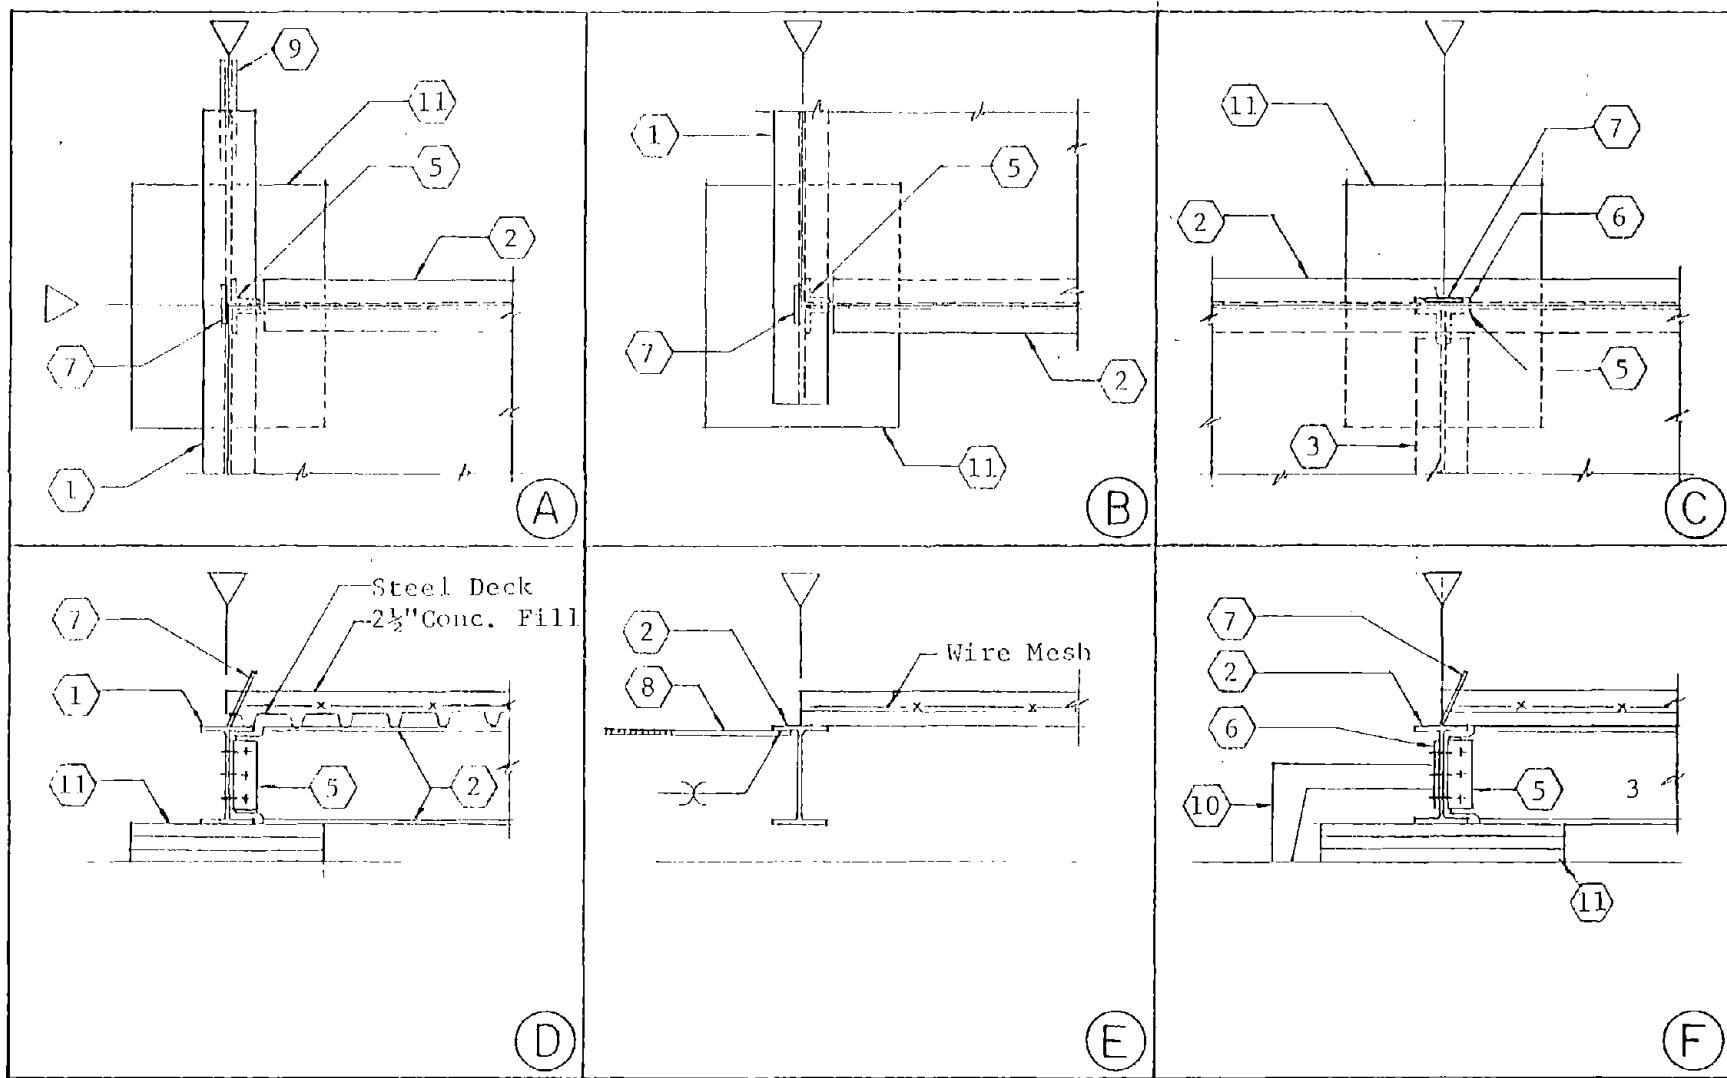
STEEL DECK DIAPHRAGM DETAILS
